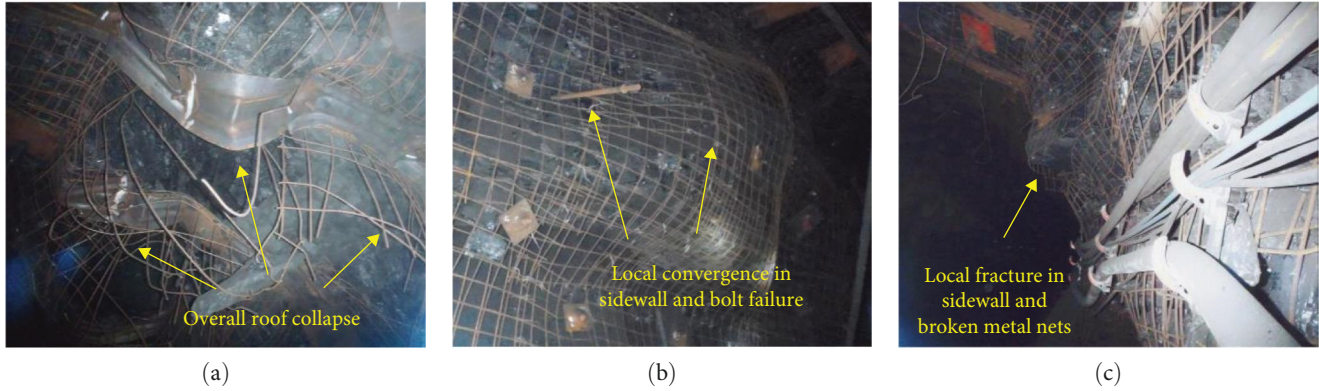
Dynamic failure of air-return roadway in 401102 working face: (a) roof; (b) left sidewall; (c) right sidewall.
